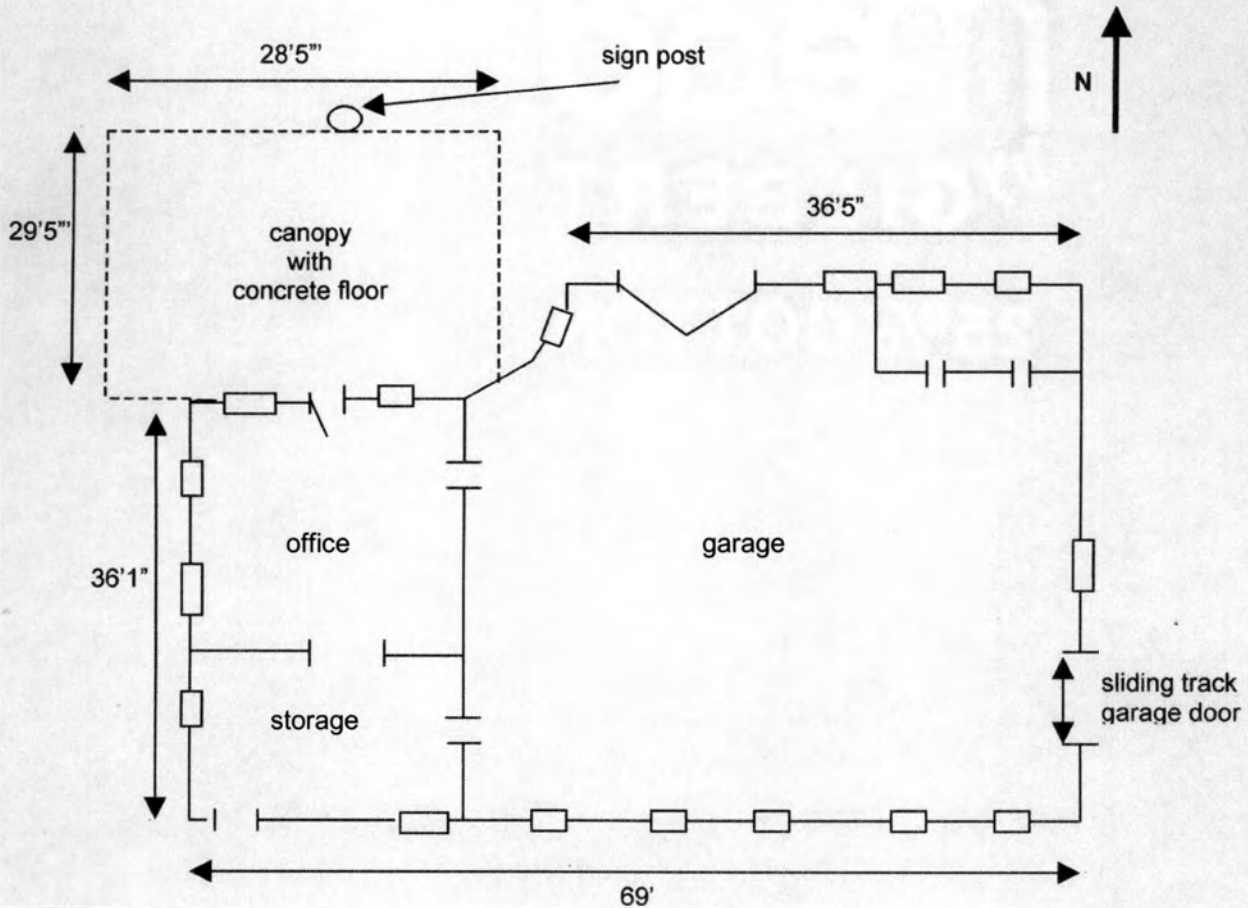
John Osterman Gas Station Floor Plan (not to scale).
